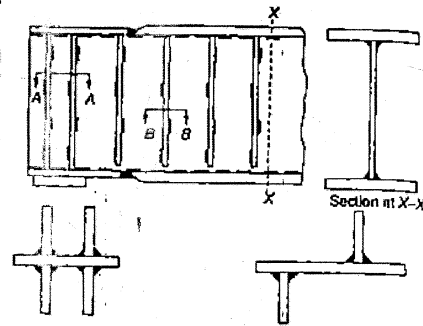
(b) Stiffeners for welded plate girder
